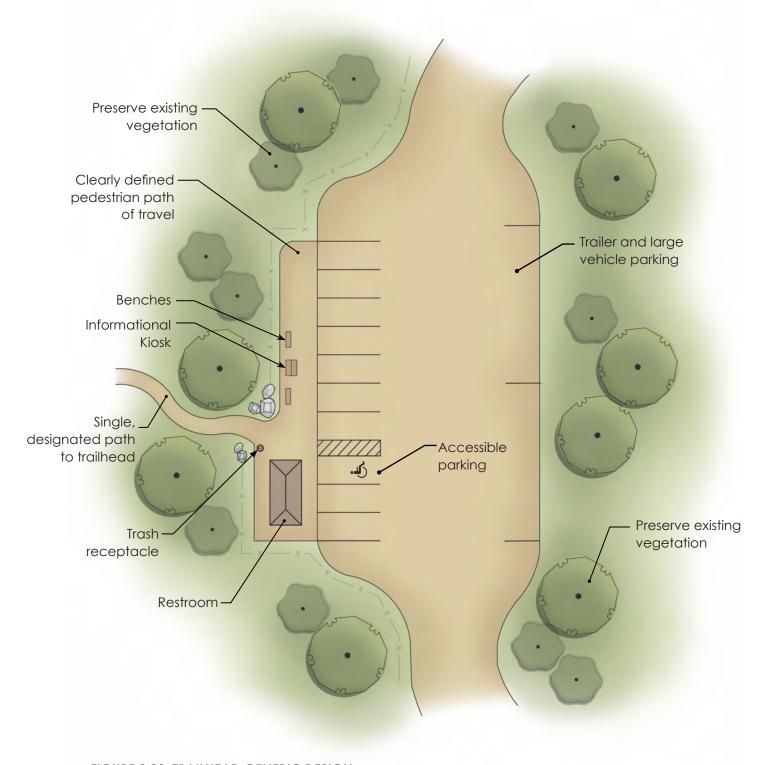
TRAILHEAD GENERIC DESIGN
